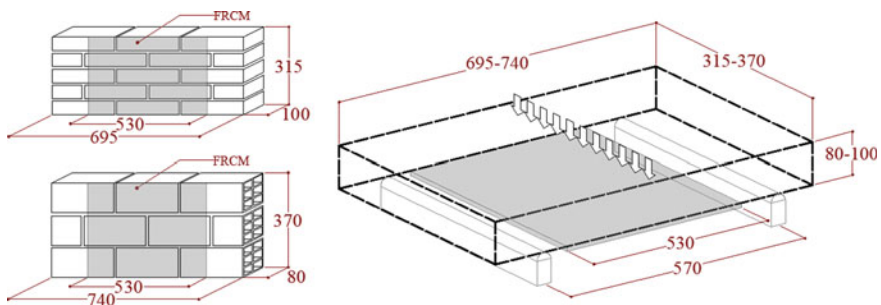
Specimens' dimensions and test set-up (dimensions in mm)
